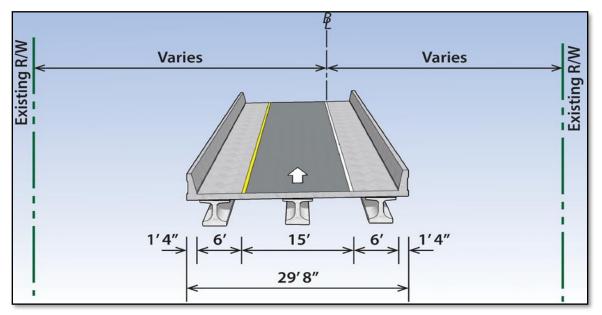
Proposed Typical Section – Whiting Street Off-Ramp (On-structure)
